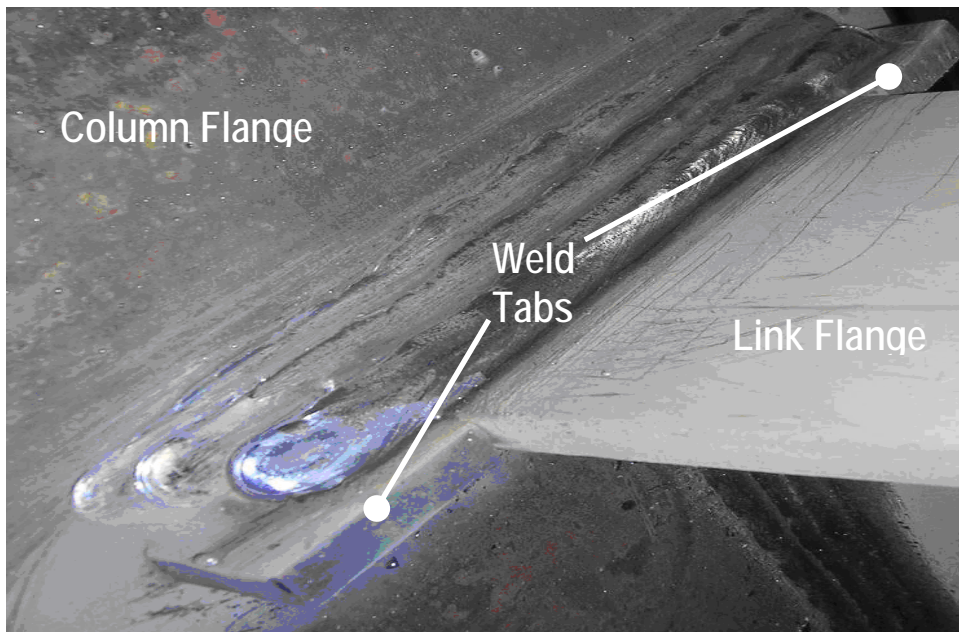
Fillet weld between link flange and column flange in Specimen AISC-2
